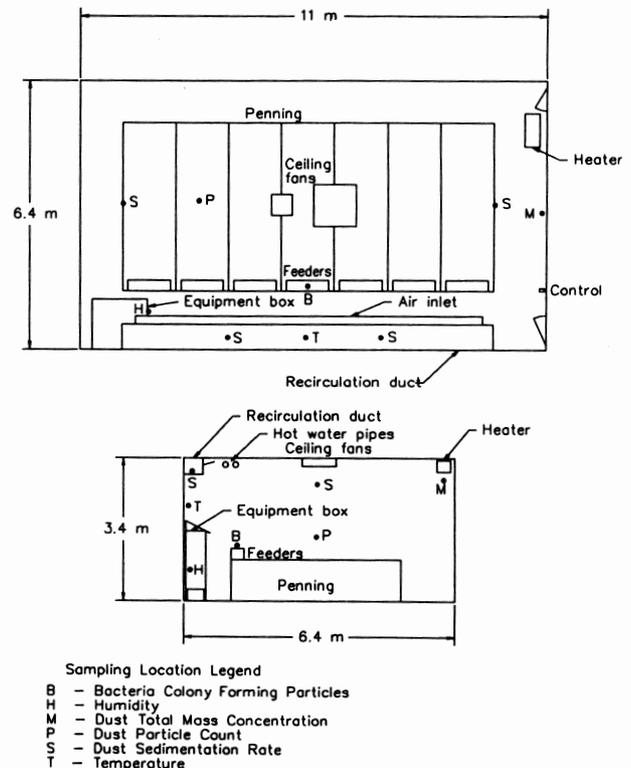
Floor plan and section view of the experimental room showing sampling locations.
